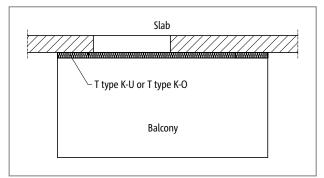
Schöck Isokorb® T type K-U/K-O: Cantilevered balcony
